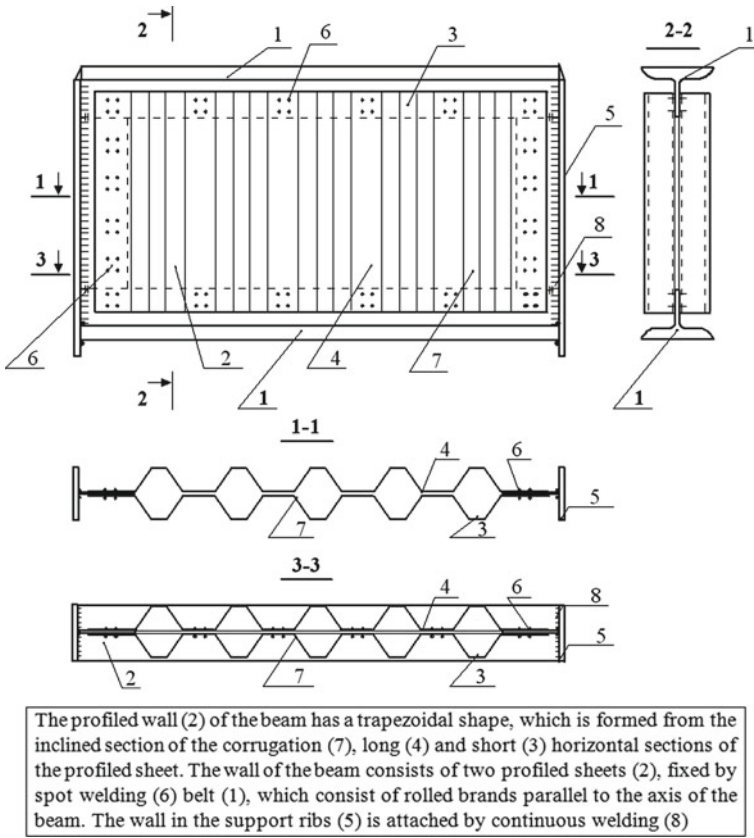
A steel beam with cross-profiled box-section wall with the t-belt from rolling [12]
